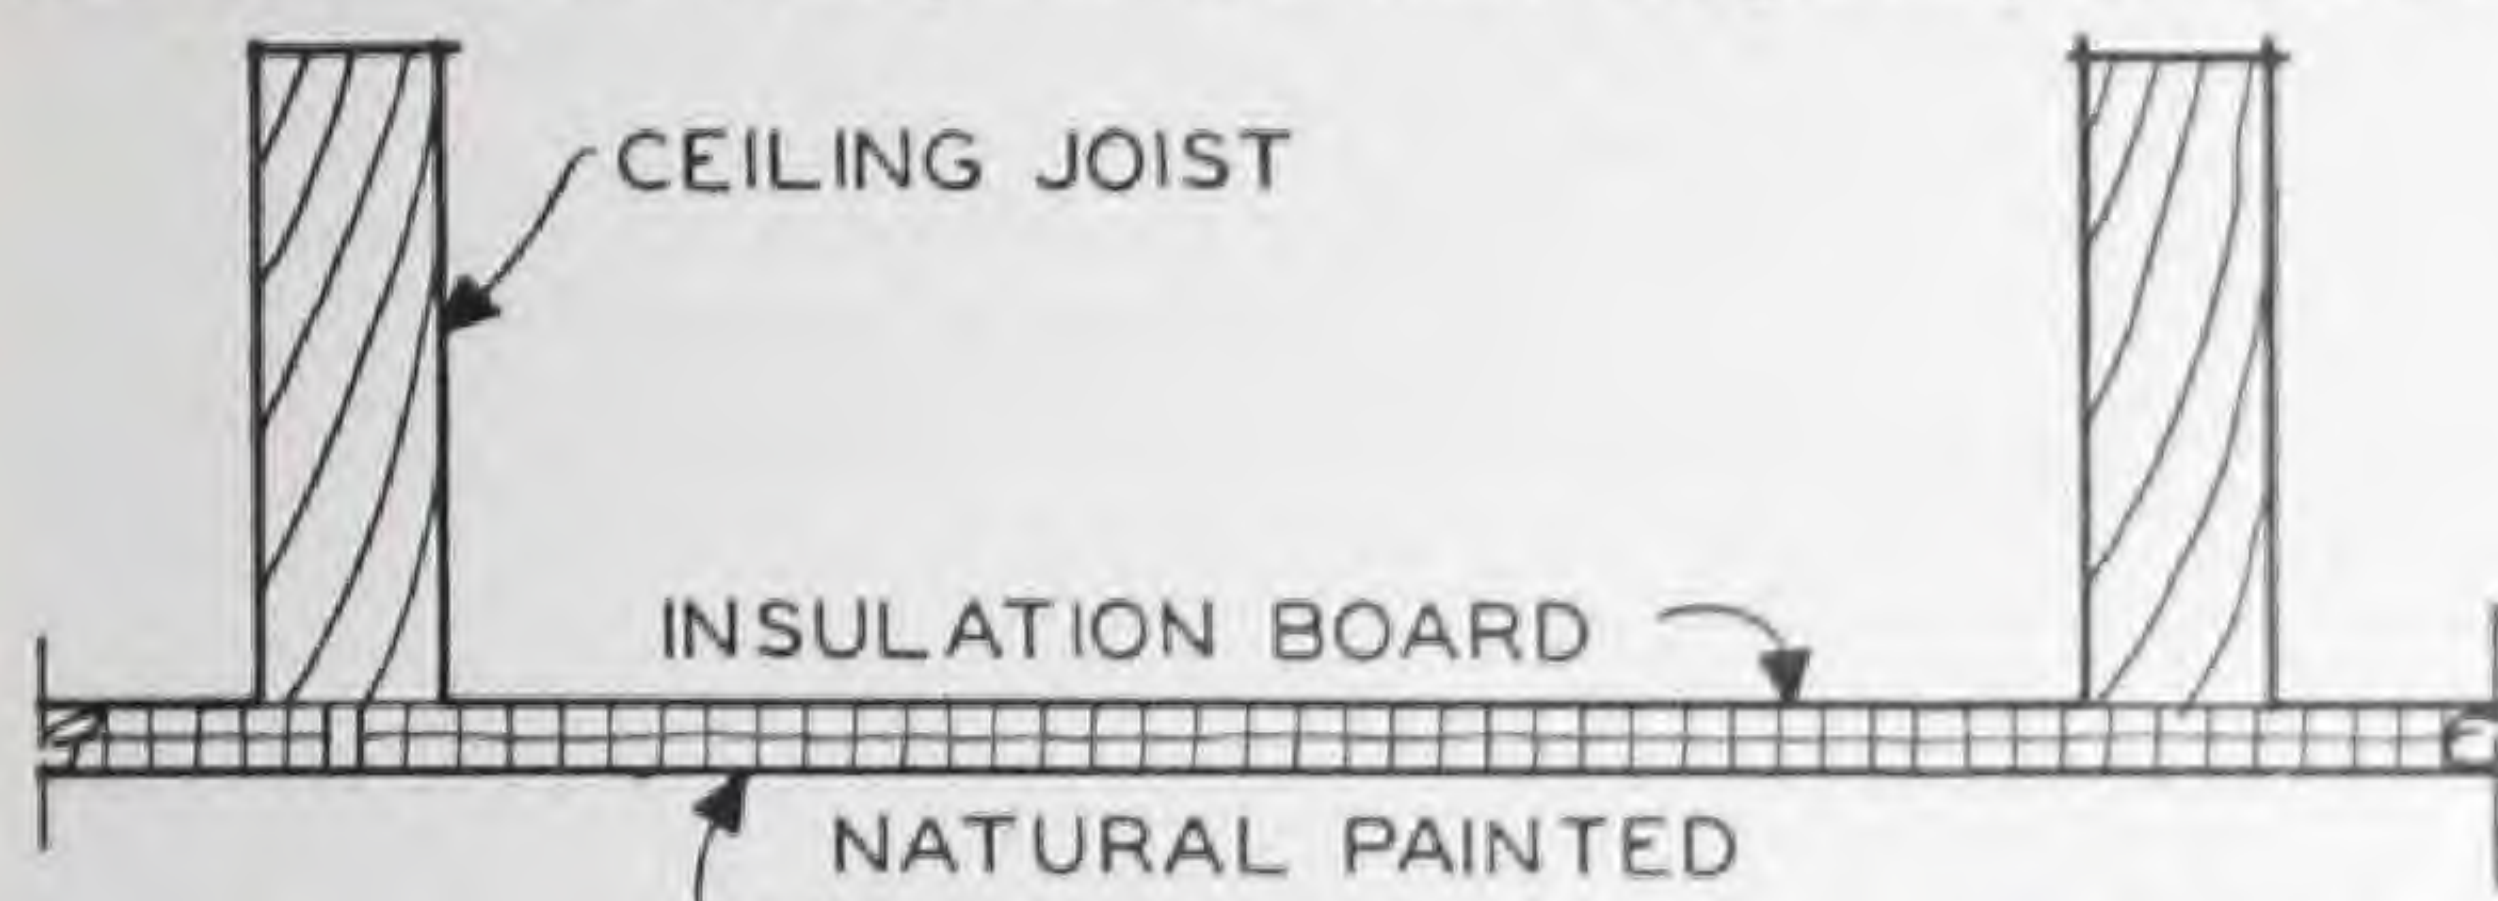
Insulation board on the under side of ceiling joists as a plaster base or interior finish.
